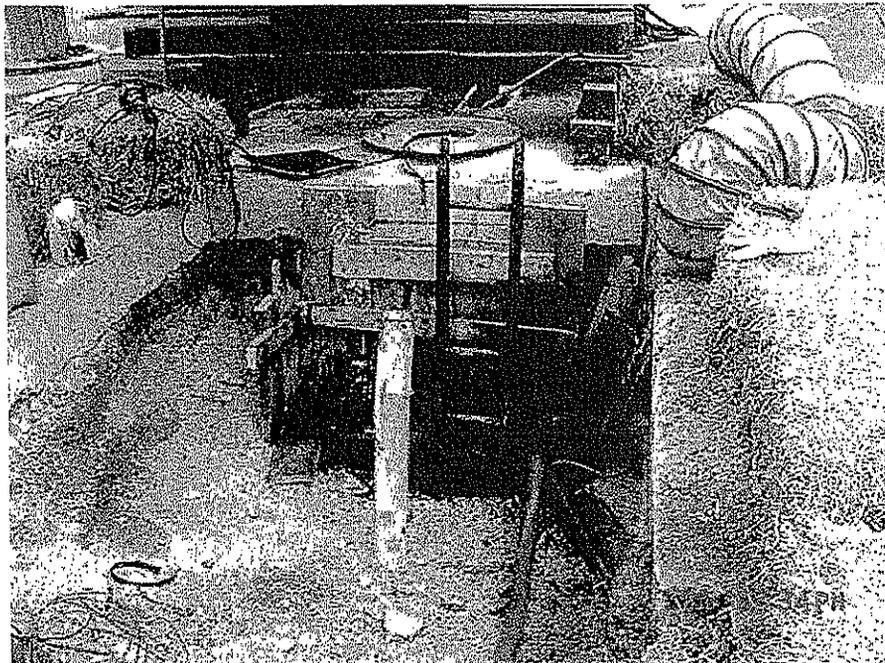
Tank #2 excavation and opening. PVC observation pipe in the foreground, where free product was found.
